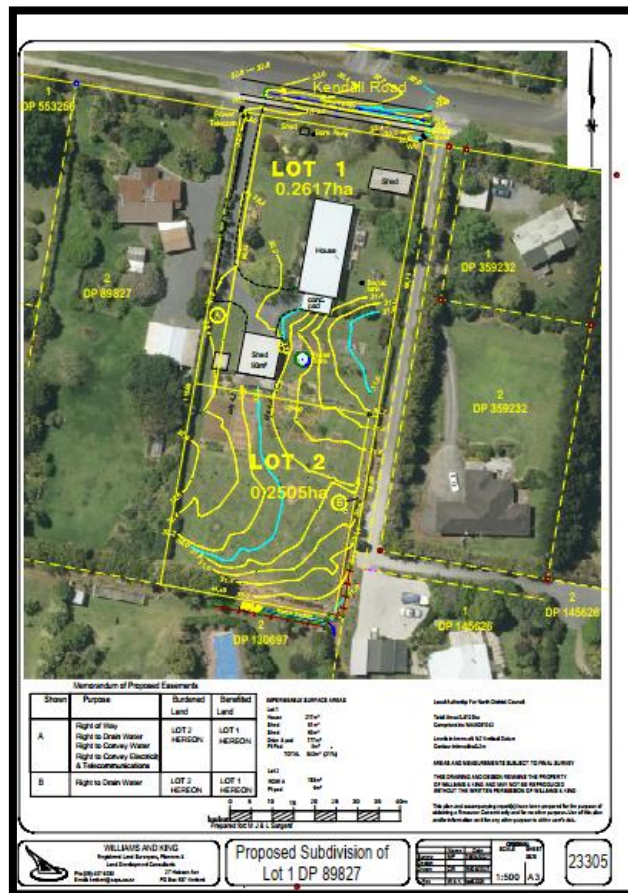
Proposed Subdivision Plan – 7 Kendall Road, Kerikeri
